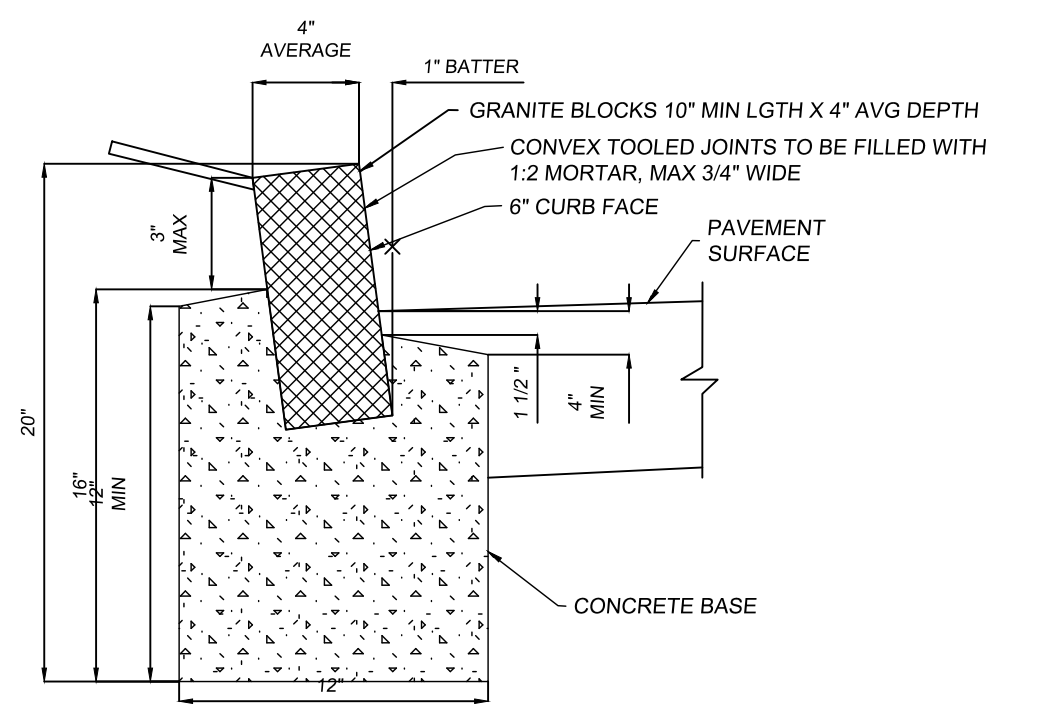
DETAIL OF NEW CONCRETE CURB AND PAVEMENT
